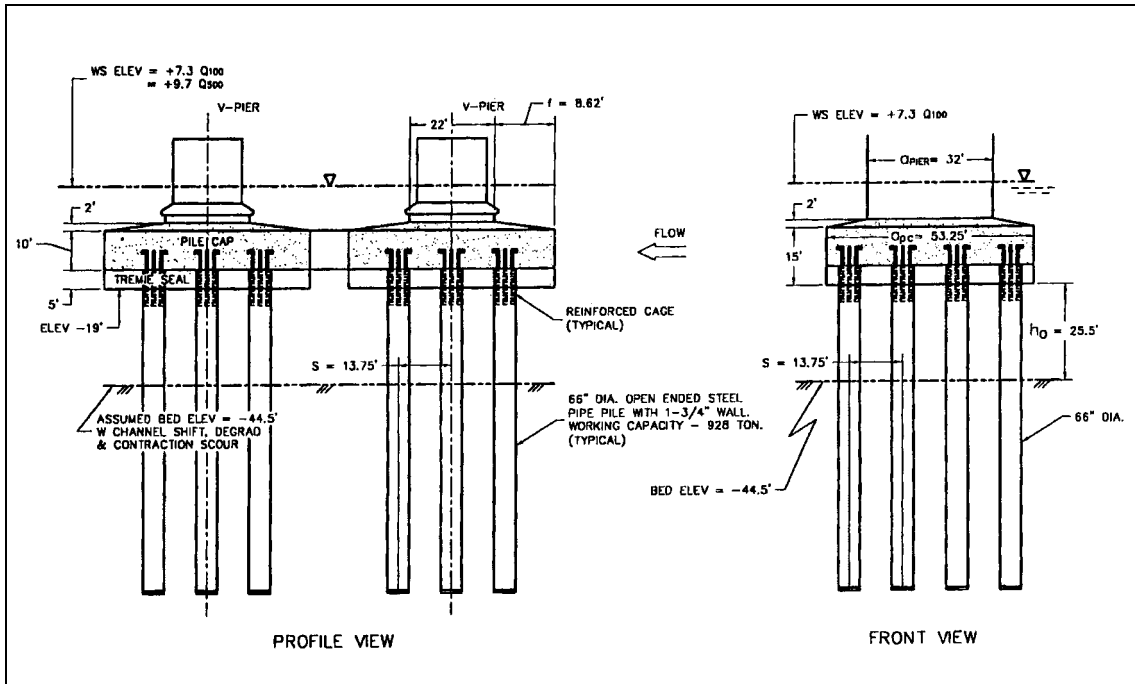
Model of complex pier geometry for the Woodrow Wilson Bridge.
